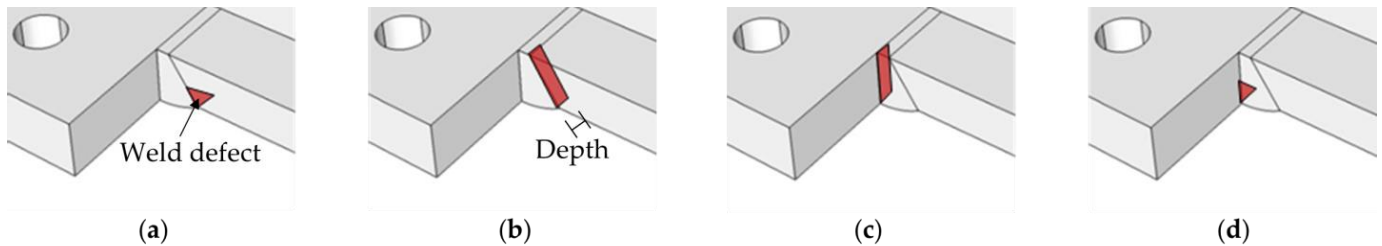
Locations and shapes of the defects: (a) flange surface crack (FSC), (b) flange through crack (FTC), (c) diaphragm through crack (DTC), and (d) diaphragm surface crack (DSC).
